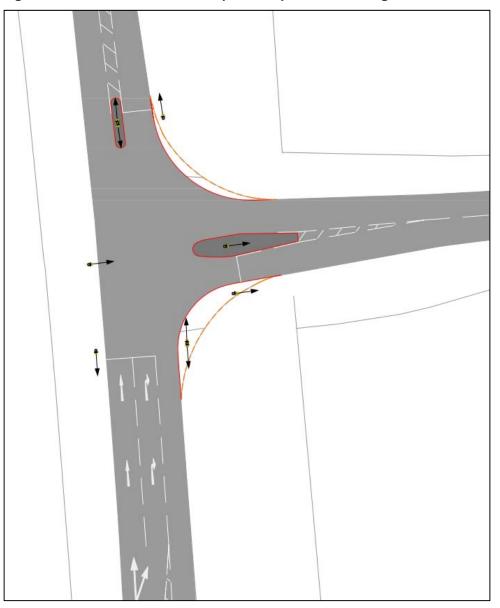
A596 / Jubilee Road Proposed Improvement Design
